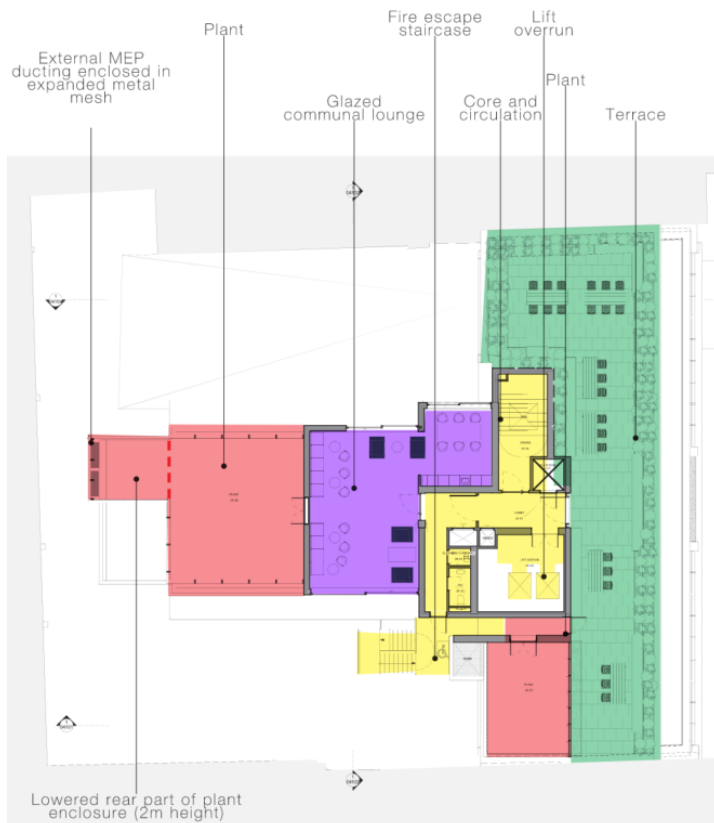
Proposed 8<sup>th</sup> (rooftop) floor plan
